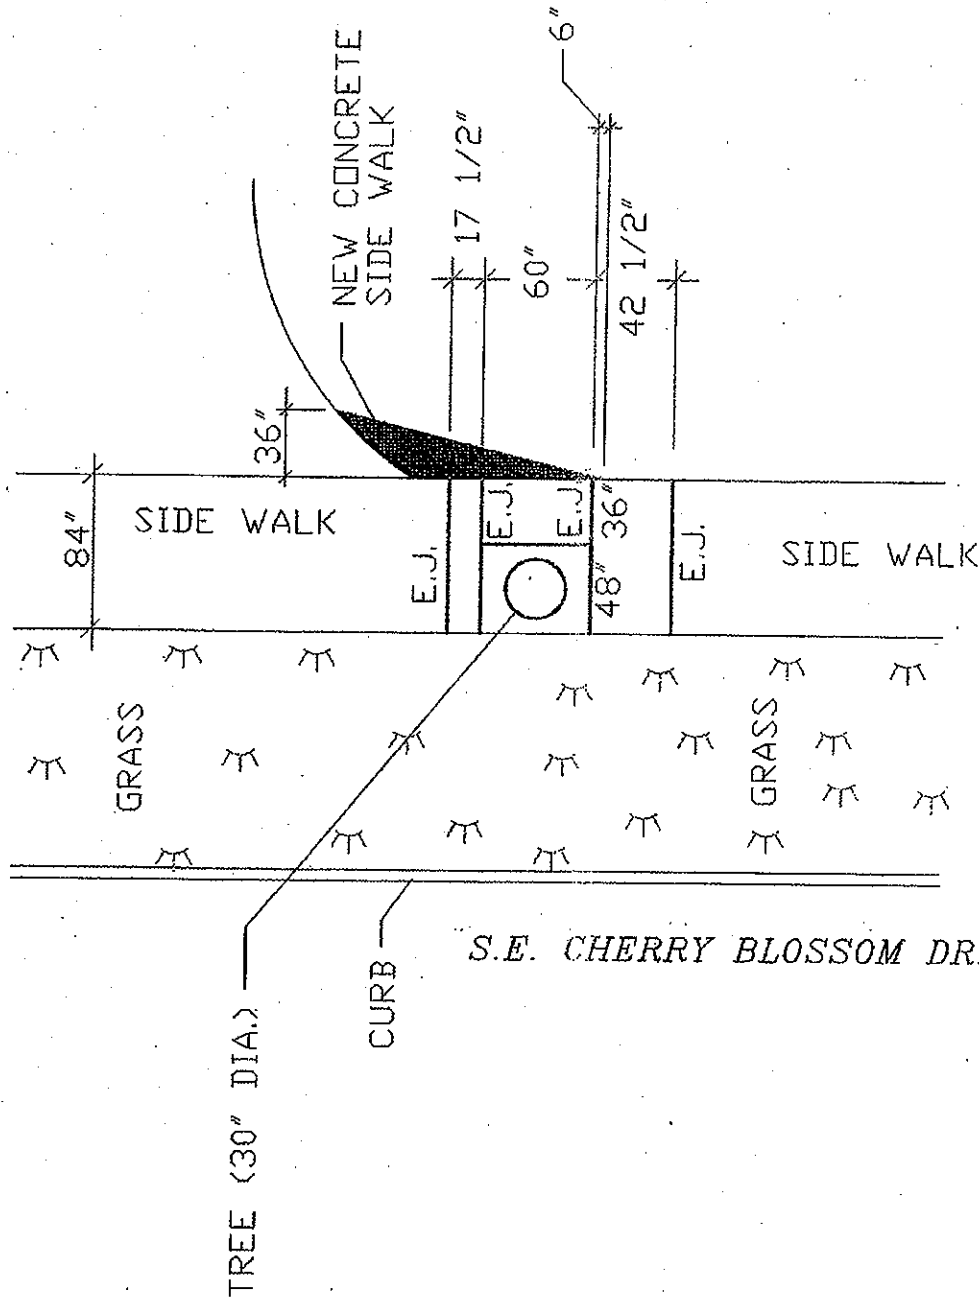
" SIDEWALK EAST OF BUILDING ENTRANCE
